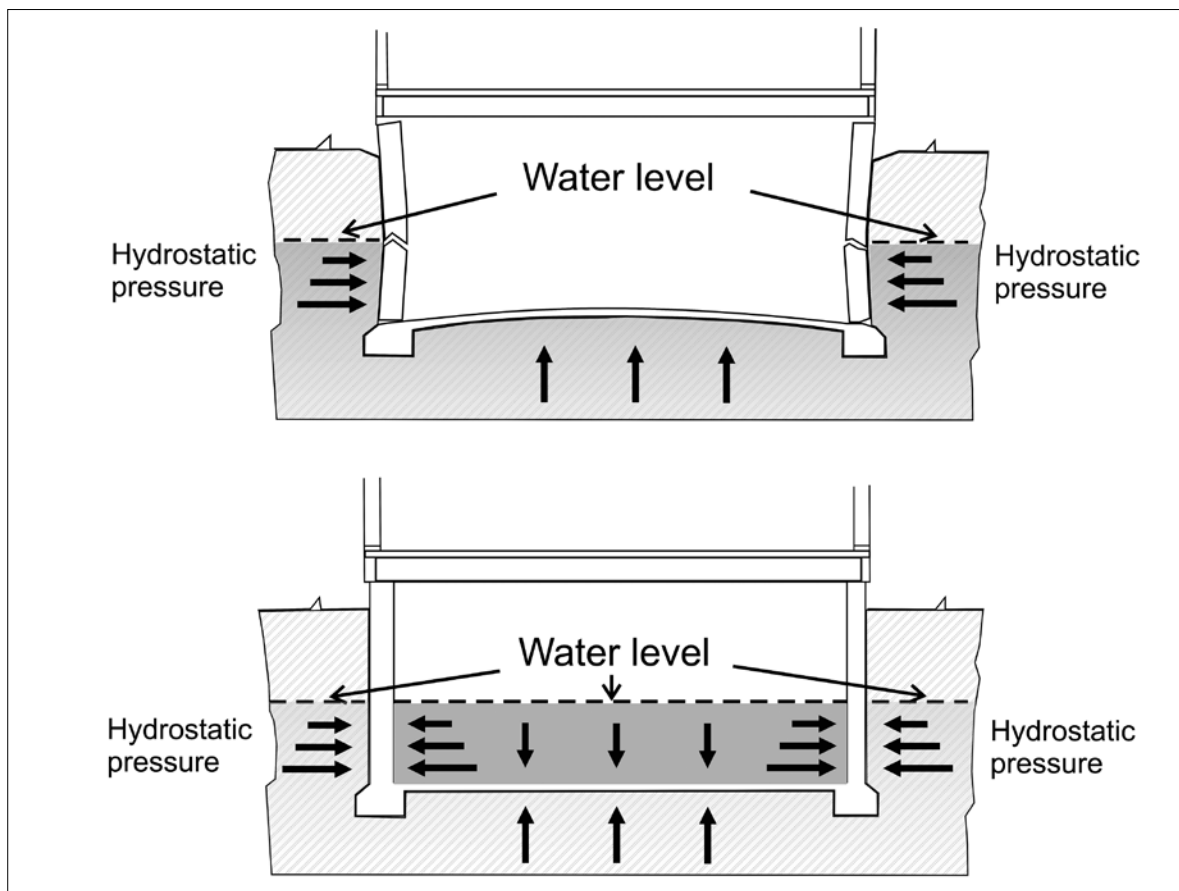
Principle of preventing damage to basement floors and walls caused by external hydrostatic water pressure by means of balancing interior water flooding
